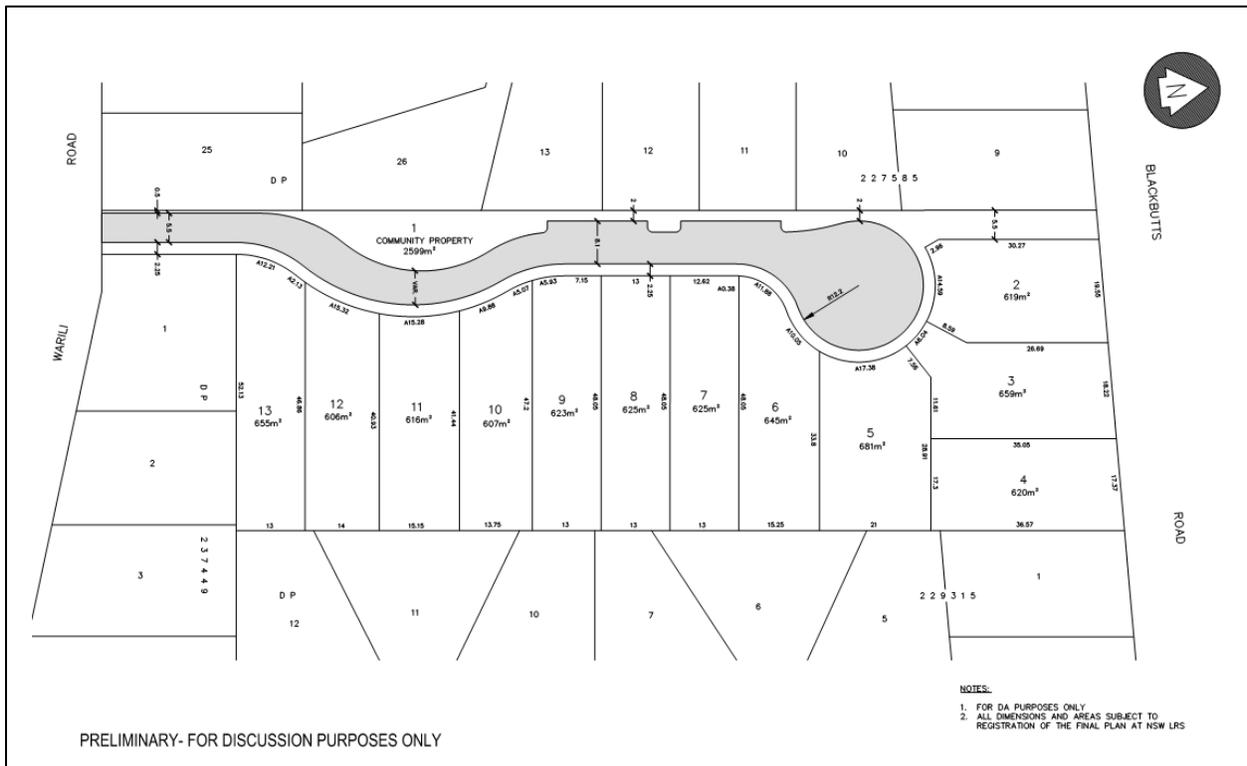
Proposed Plan of Subdivision (Source: YSCO Geomatics, 2024)
